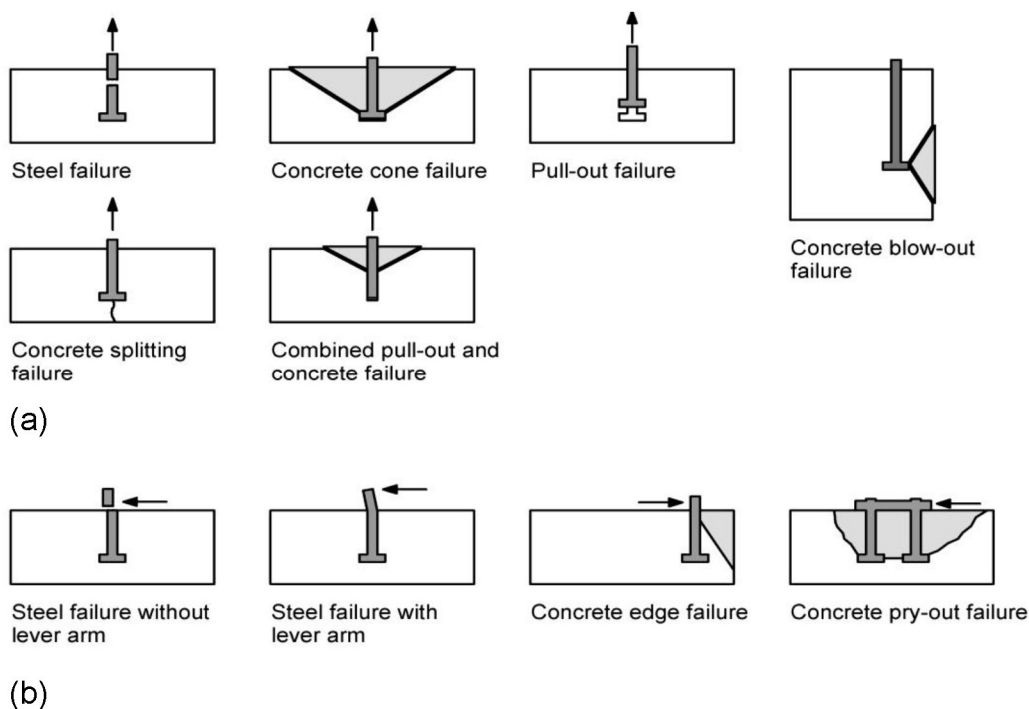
Failure modes under (a) tension and (b) shear load. Redrawn on the basis of EN 1992-4.
